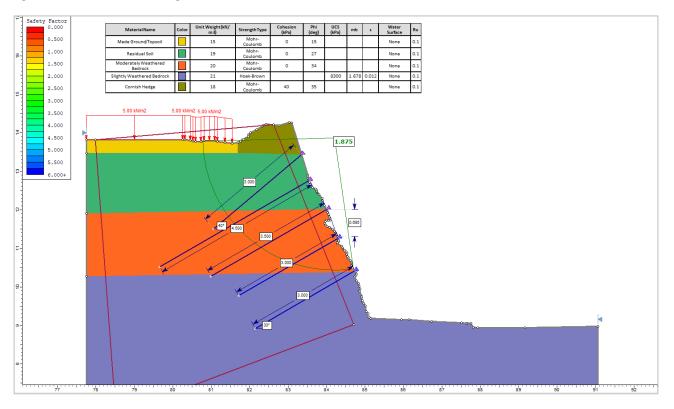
Section 5 – Facing Installation - BS8006 Set1
